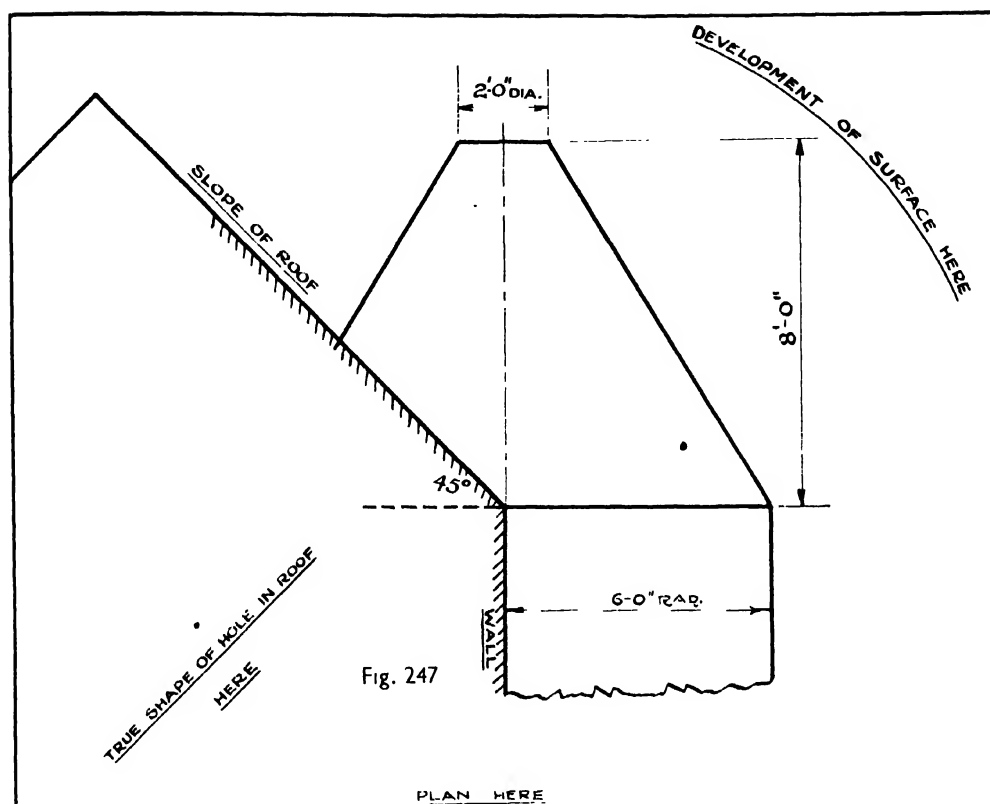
shows the elevation of a semi-circular tower surmounted by a conical turret. The tower projects from the wall of a building and the turret is cut by the sloping roof. Draw, to a scale of $\frac{1}{2}$ " to a foot, the given view and add:—
